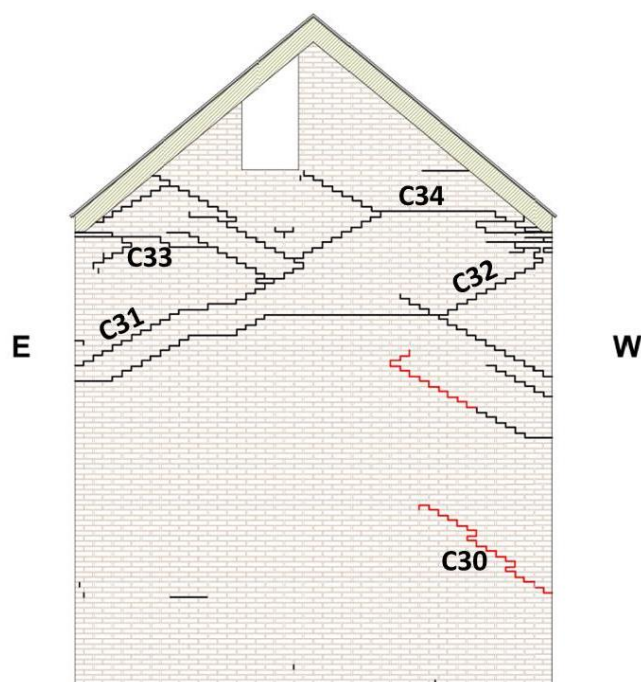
EQ-NPR IS 133% cracks - North clay façade.
